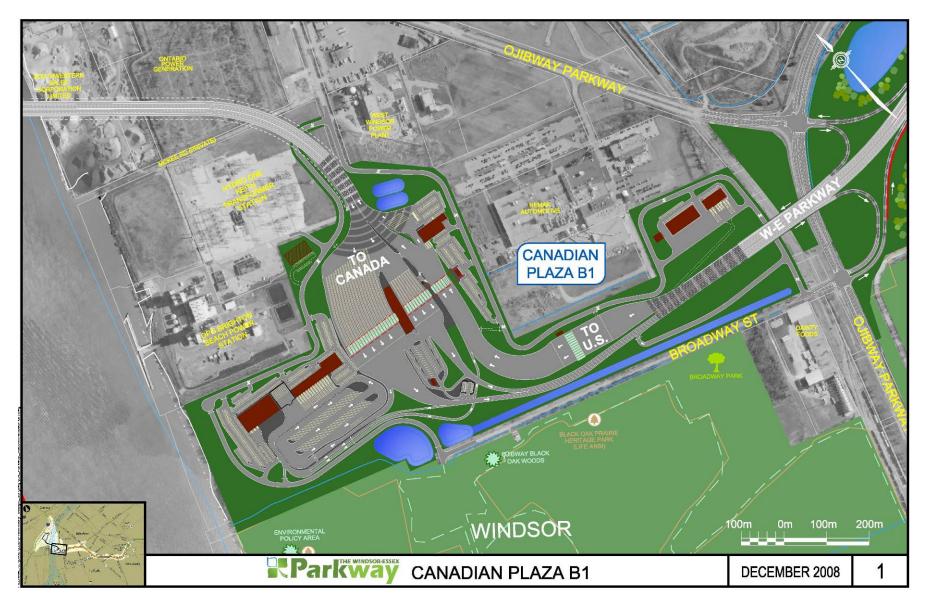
PROPOSED SITE PLAN FOR THE CUSTOMS INSPECTION PLAZA
